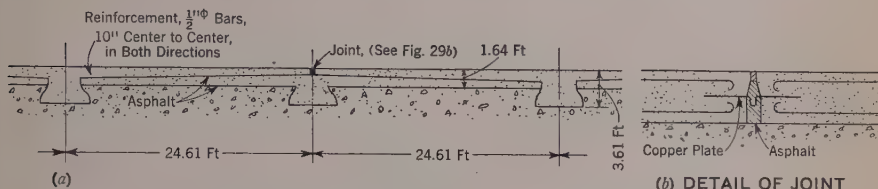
REINFORCED CONCRETE FACING, TEPUXTEPEC DAM
